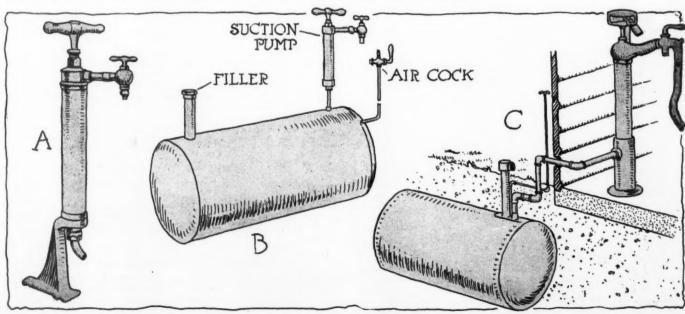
A, gasoline pump for garage. B, complete underground outfit. C, method of installing tank with inside pump
